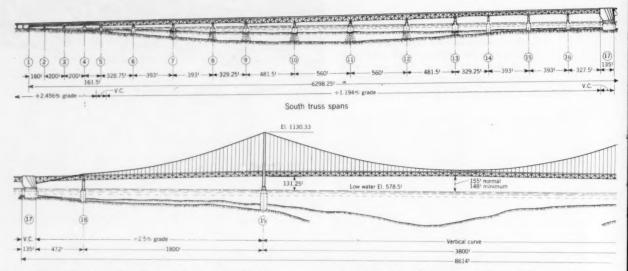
Of the 33 water piers, 30 were built in open cofferdams and three (Piers 18, 19, and 20) in open-dredged caissons. Piles
